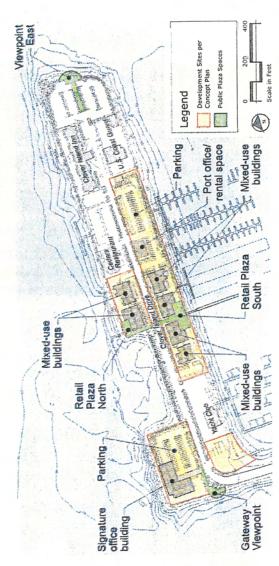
Illustrating Key Site Planning Elements of the Clover Island Plan Concept
